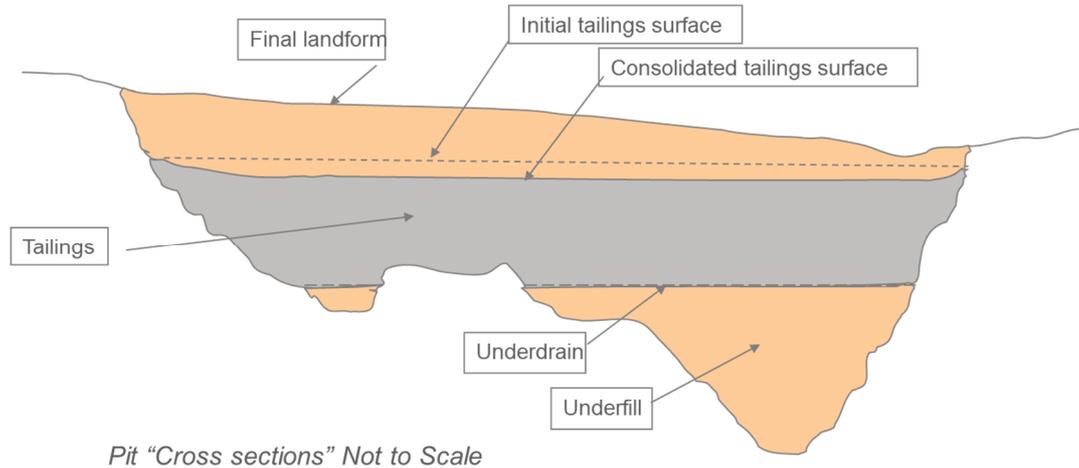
Conceptual design of Pit 3 tailings storage and capping
